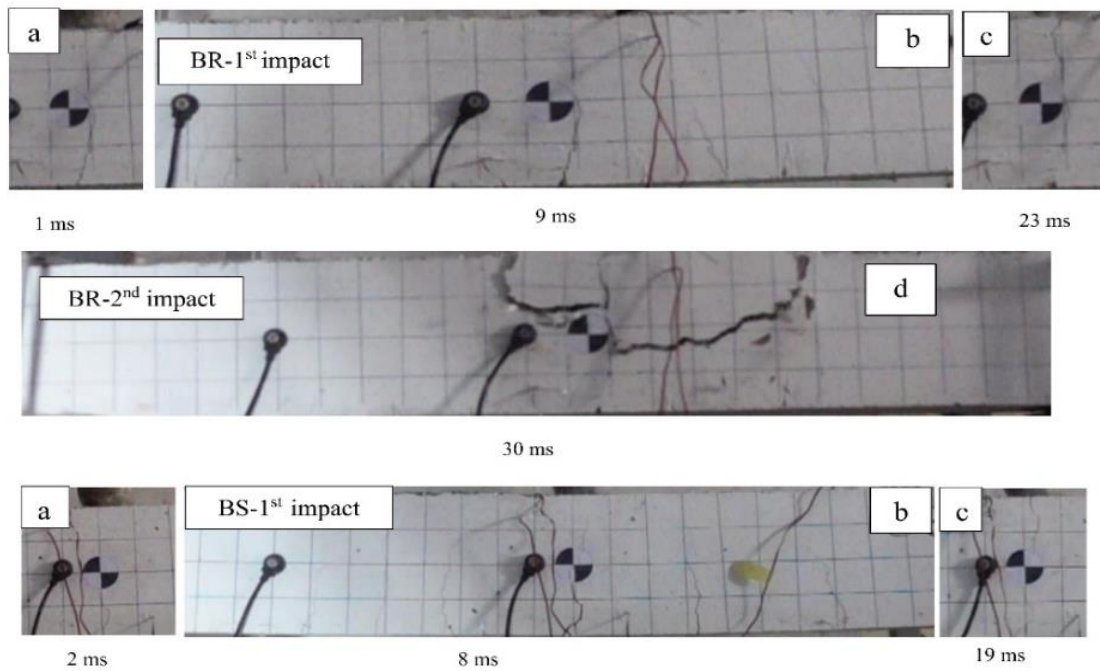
Failure and crack patterns with time, for BR and BS: (a) first crack; (b) maximum crack distribution; (c) crack at compression zone; (d) maximum crack width at second impact
